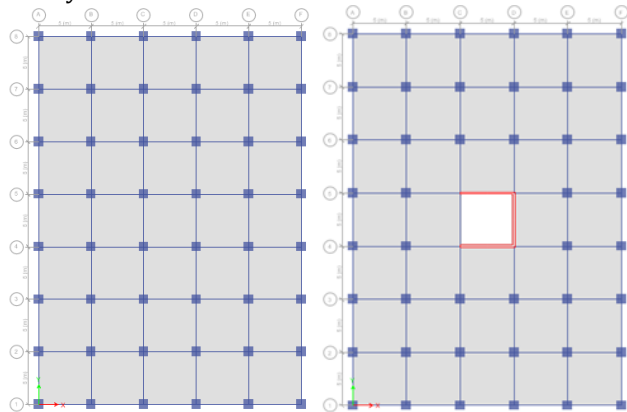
Plan of regular buildings (without shear wall and with lift core shear wall)
